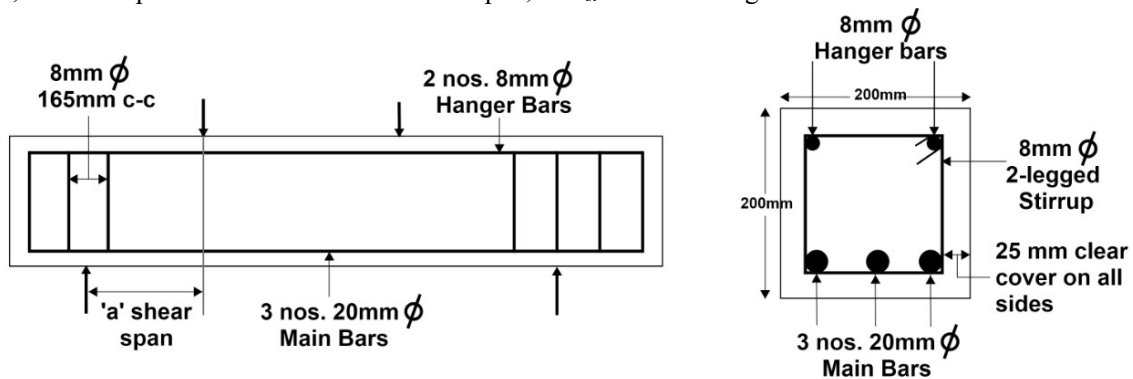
Sketch for design details of Reinforced Concrete Beam
